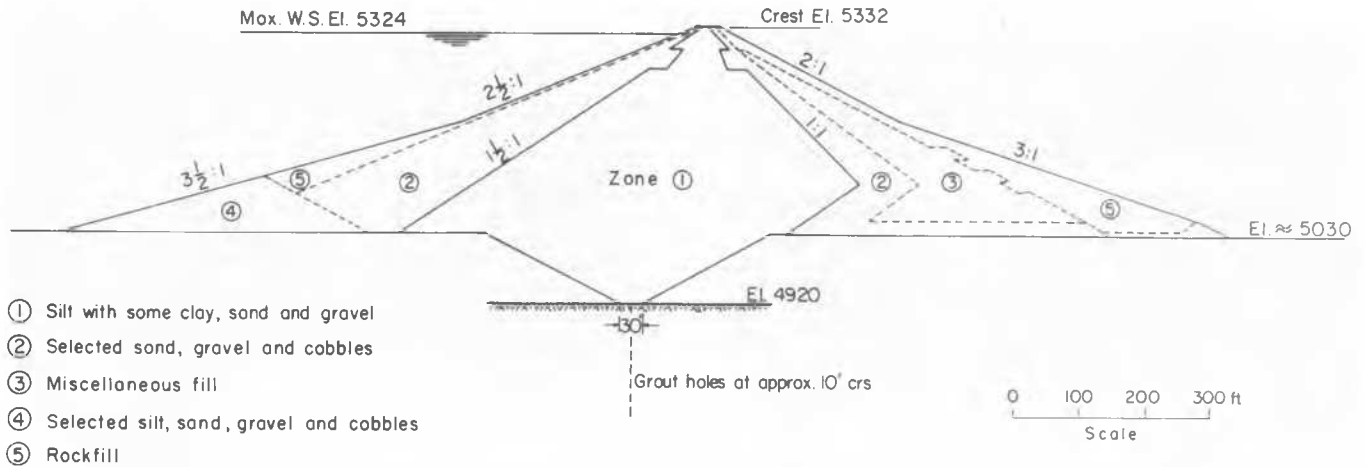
Cross-Section Through Center Portion of Embankment Founded on Alluvium
